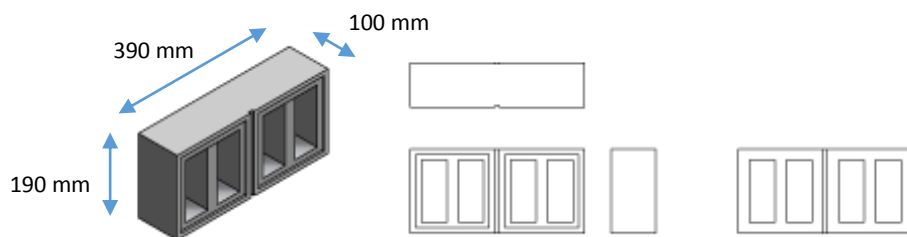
Type A concrete vent blocks at PJ Trace Centre
